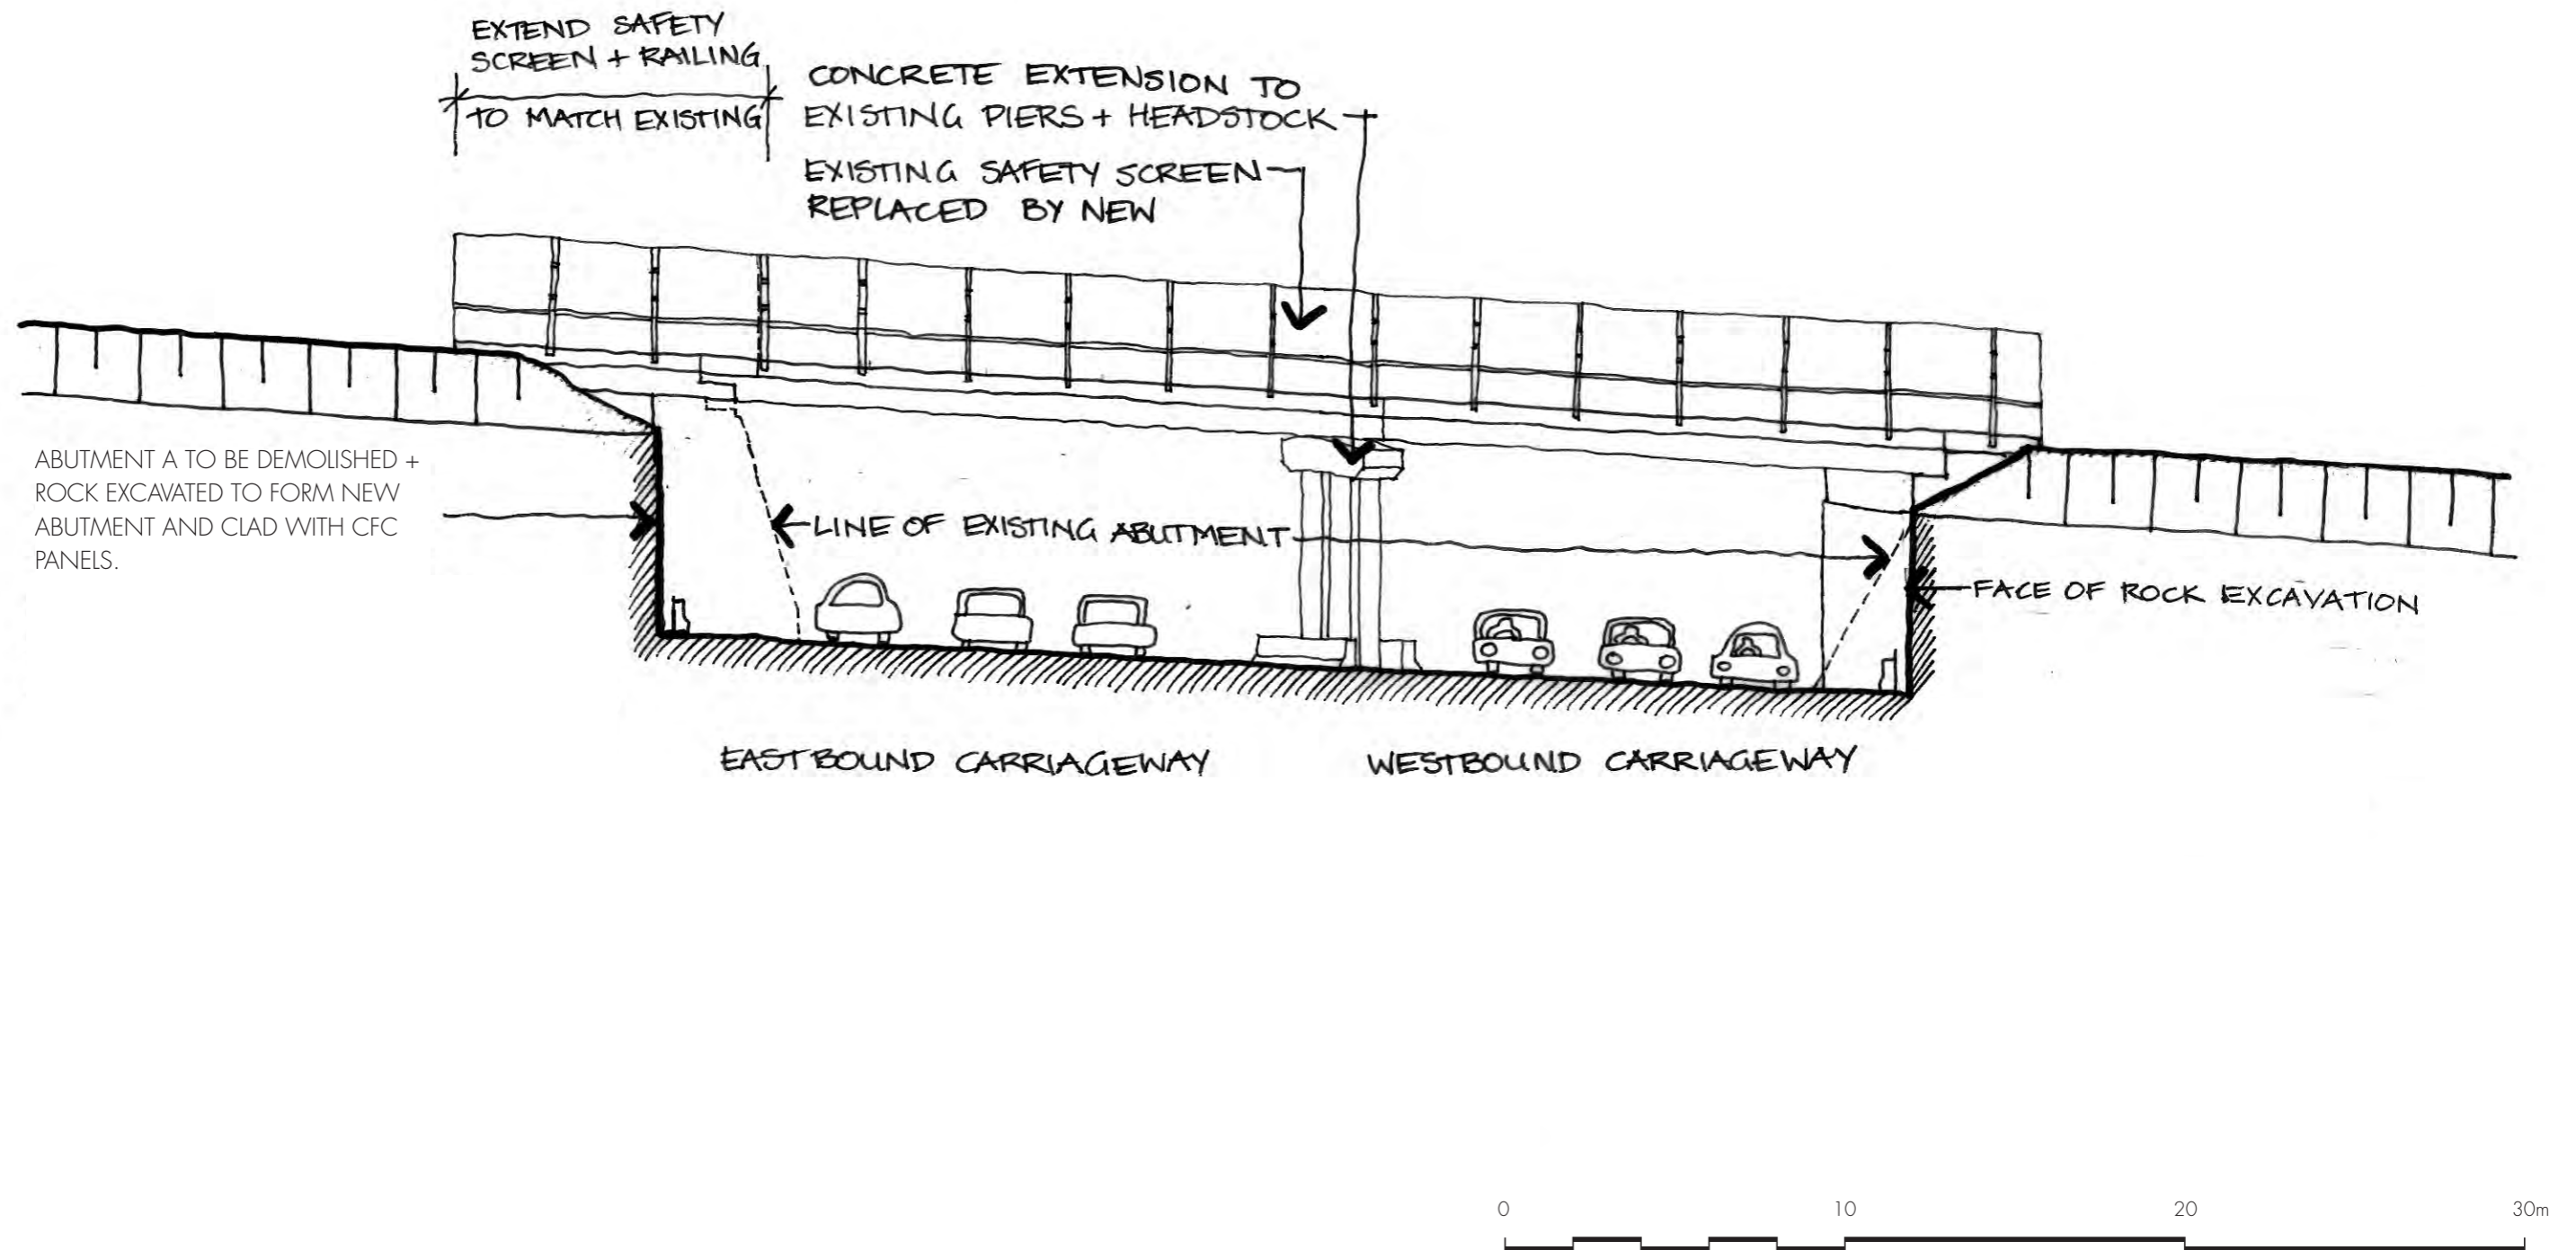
Bridge 5.1 Christie Road Bridge - Elevation
